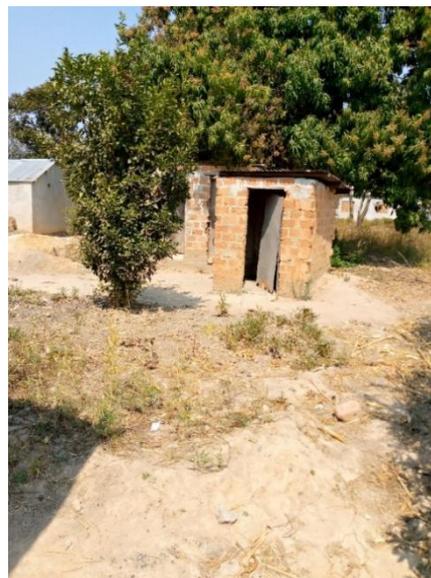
Typical Traditional Pit Latrines used in Mansa Town (Source: Author).
